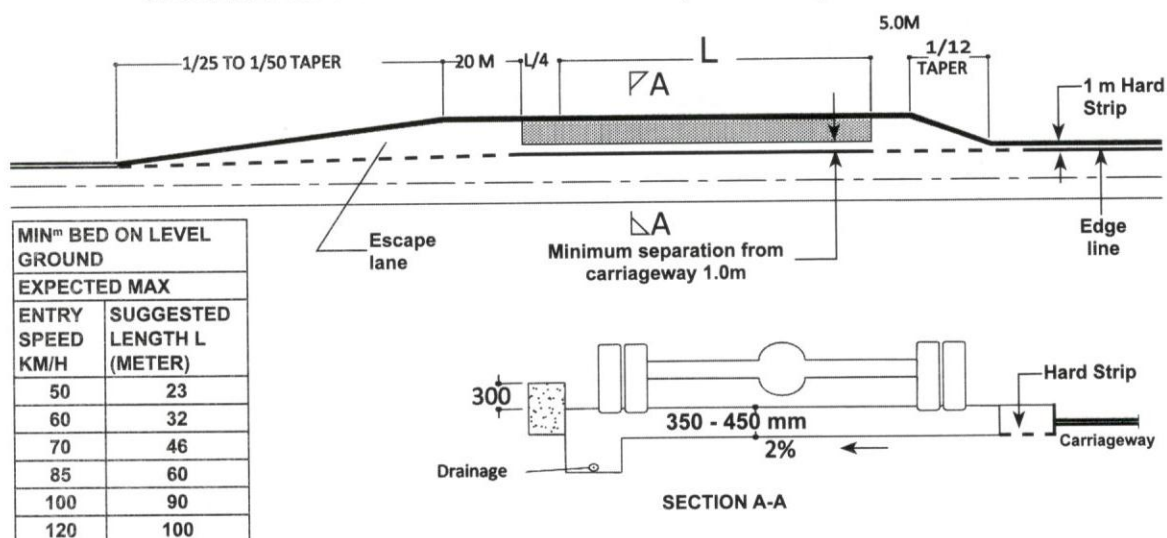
Layout of Arrester Bed Adjacent to Carriageway
